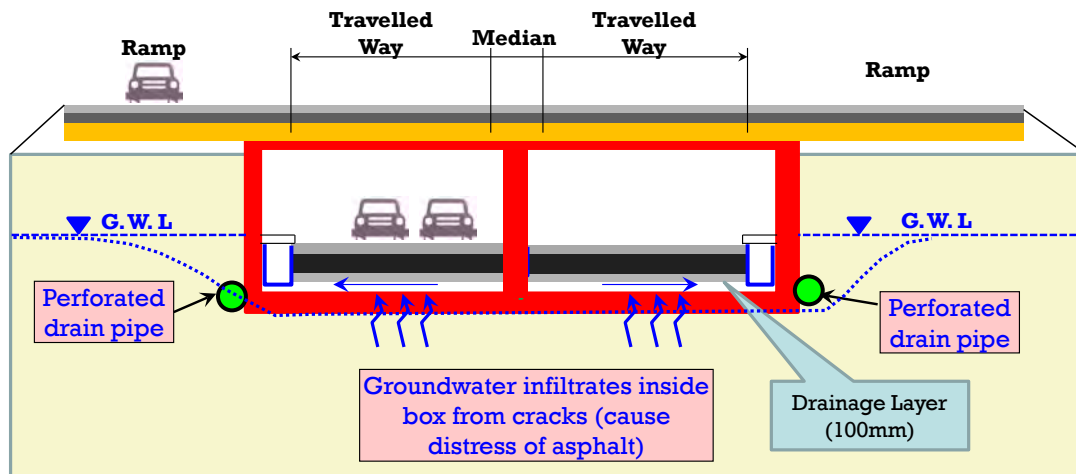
Underground Drainage Pipe Layout in BOX Culvert Section
